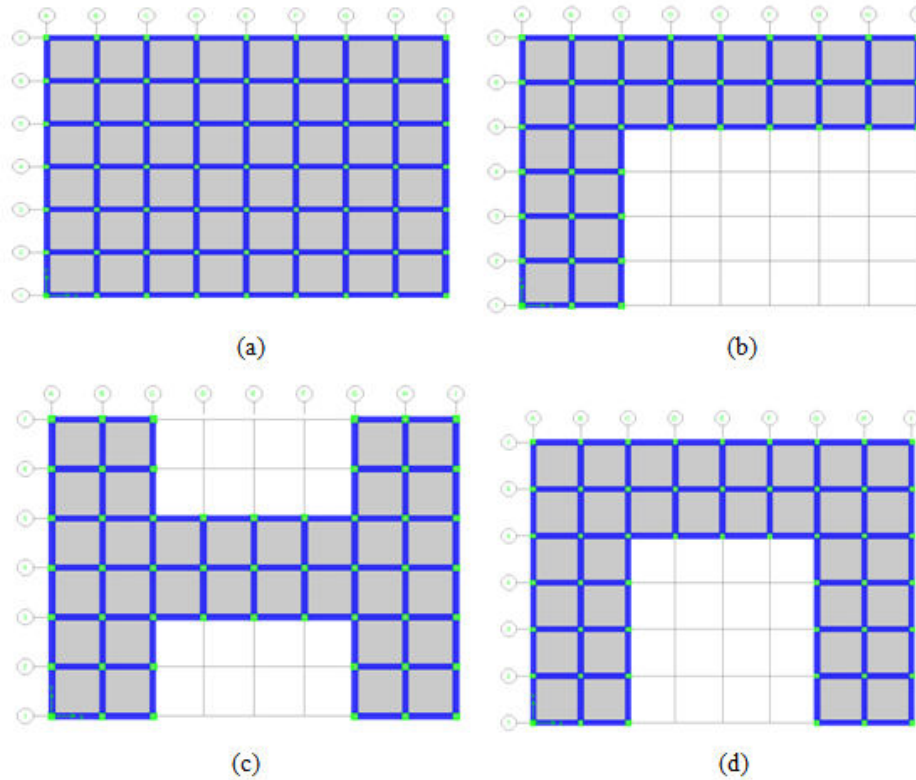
plan (a) Rectangular (b) L-shape (c) I-shape (d) C-shape (Abhay Guleria, 2014)
